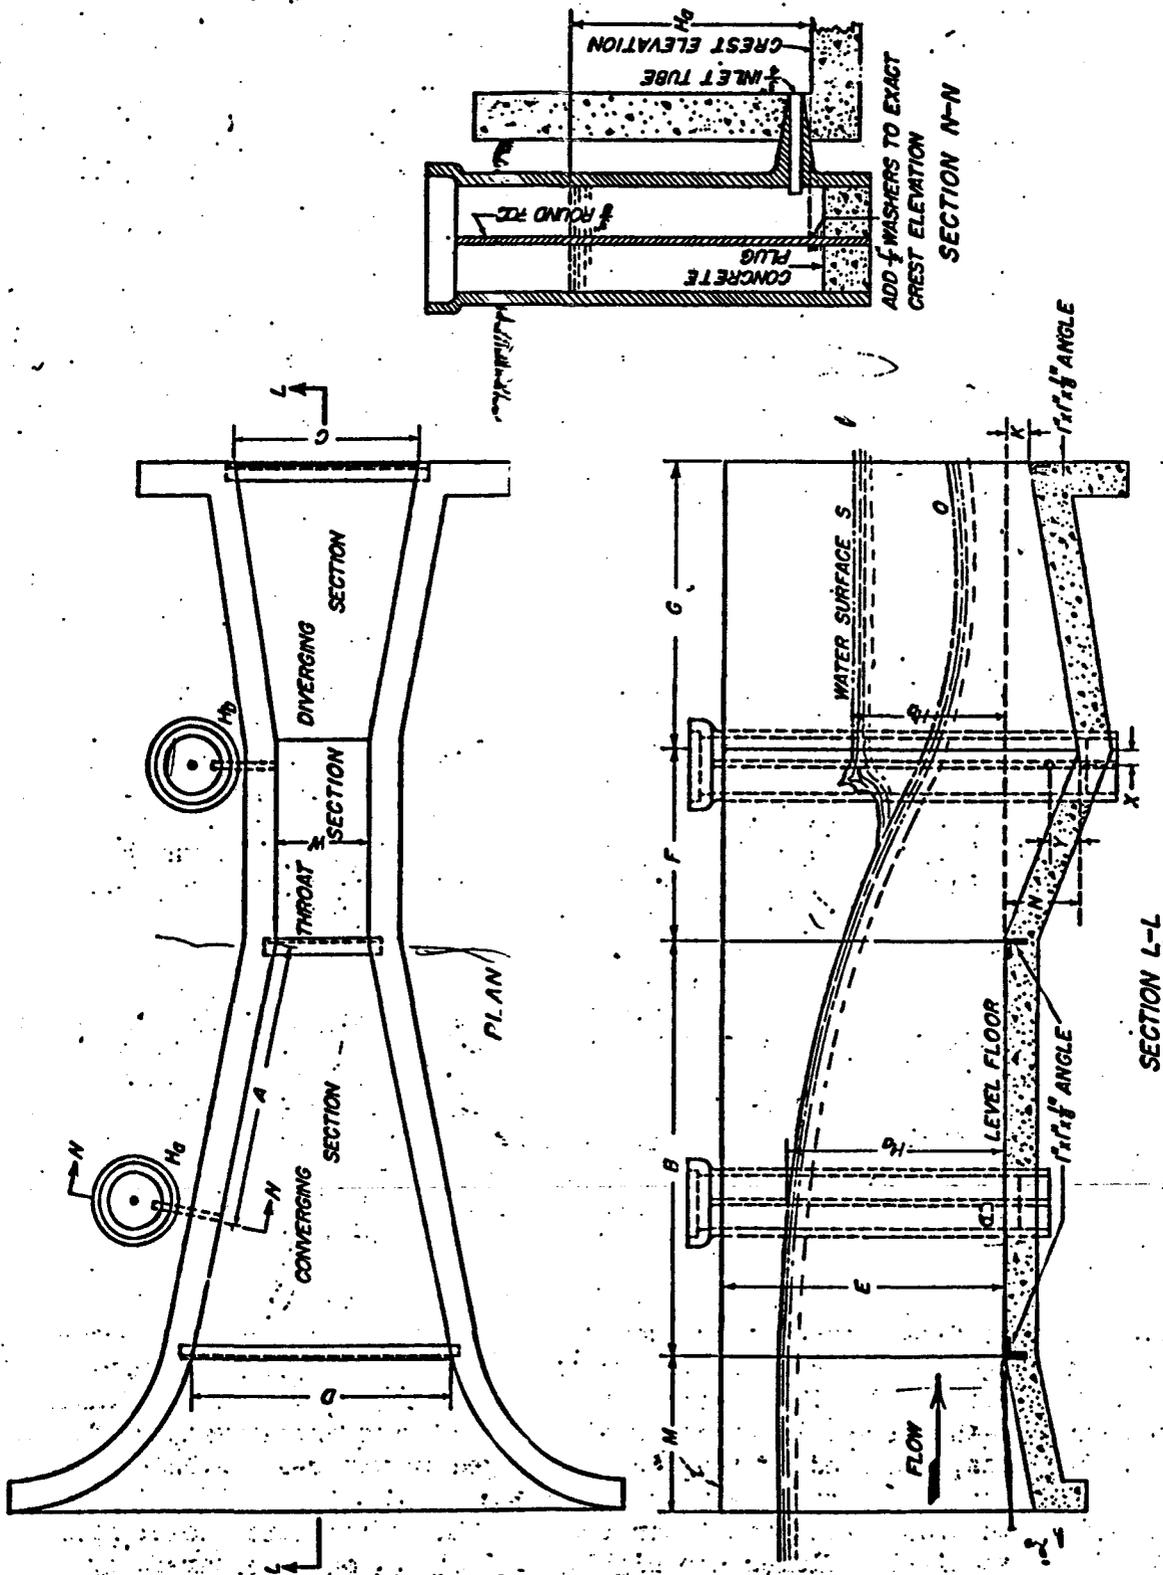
Plan and elevation of a concrete Parshall measuring flume showing component parts
